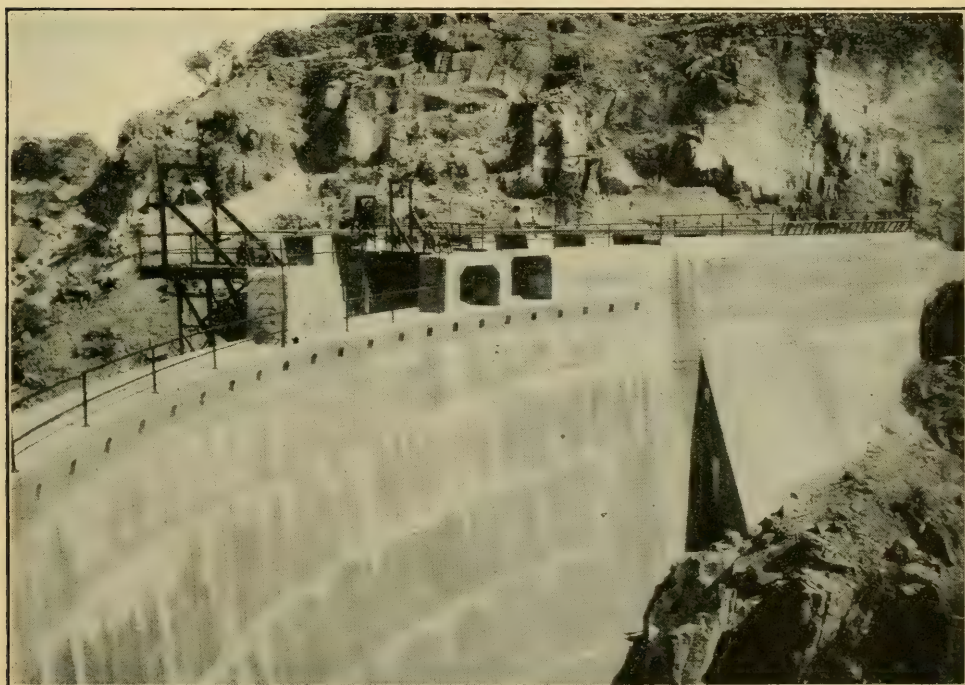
UPPER PORTION OF DAM, REAR FACE. GRAVITY SECTION ABUTMENT AT EAST END.
